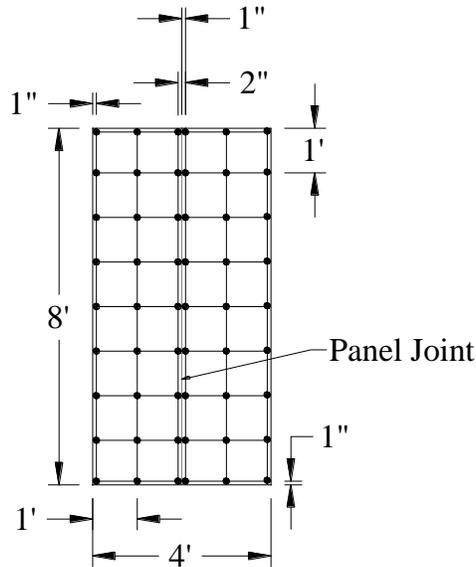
Typical screw pattern for plywood attachment to timber deck
